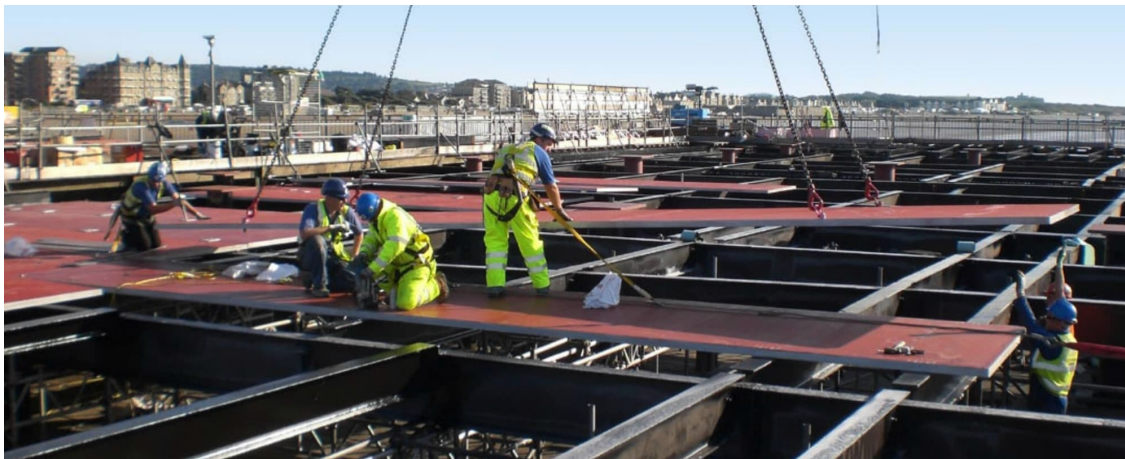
Demountable floor system SPS panels – two steel plates with polymer core [37]
